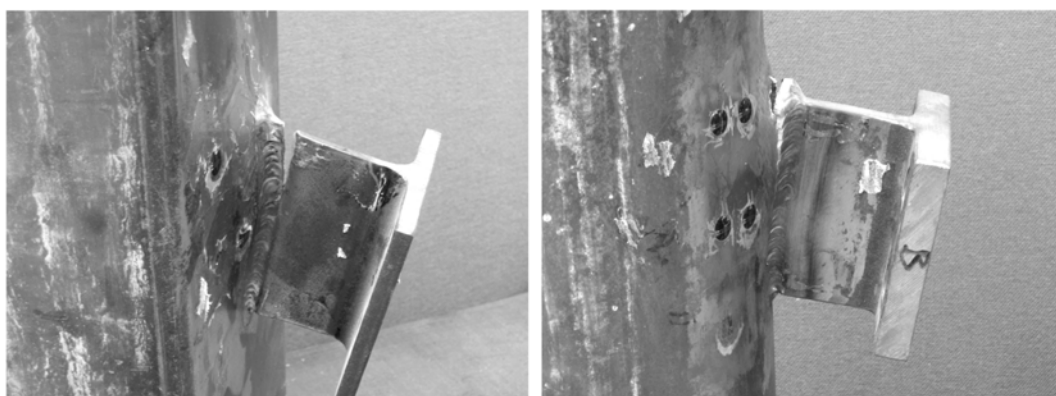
(a) Failure of the fin-plate by shear & bending (A1) (b) Tear-out of the column face around the weld (A2)
